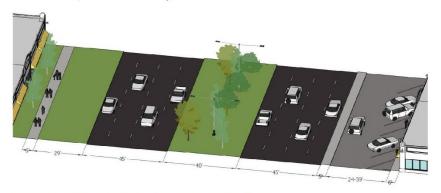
Existing 200-foot Cross-Section - Between I-696 and 14 Mile Road
